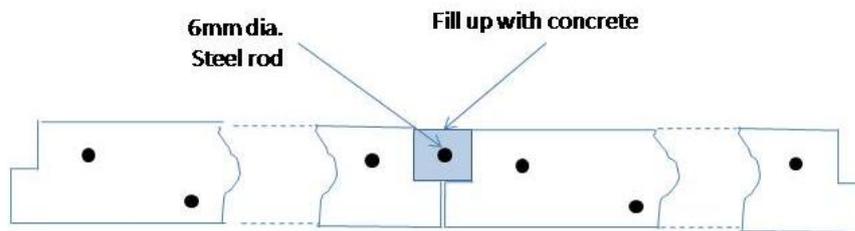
Joint Detail and Cross Section of ALC floor panel
